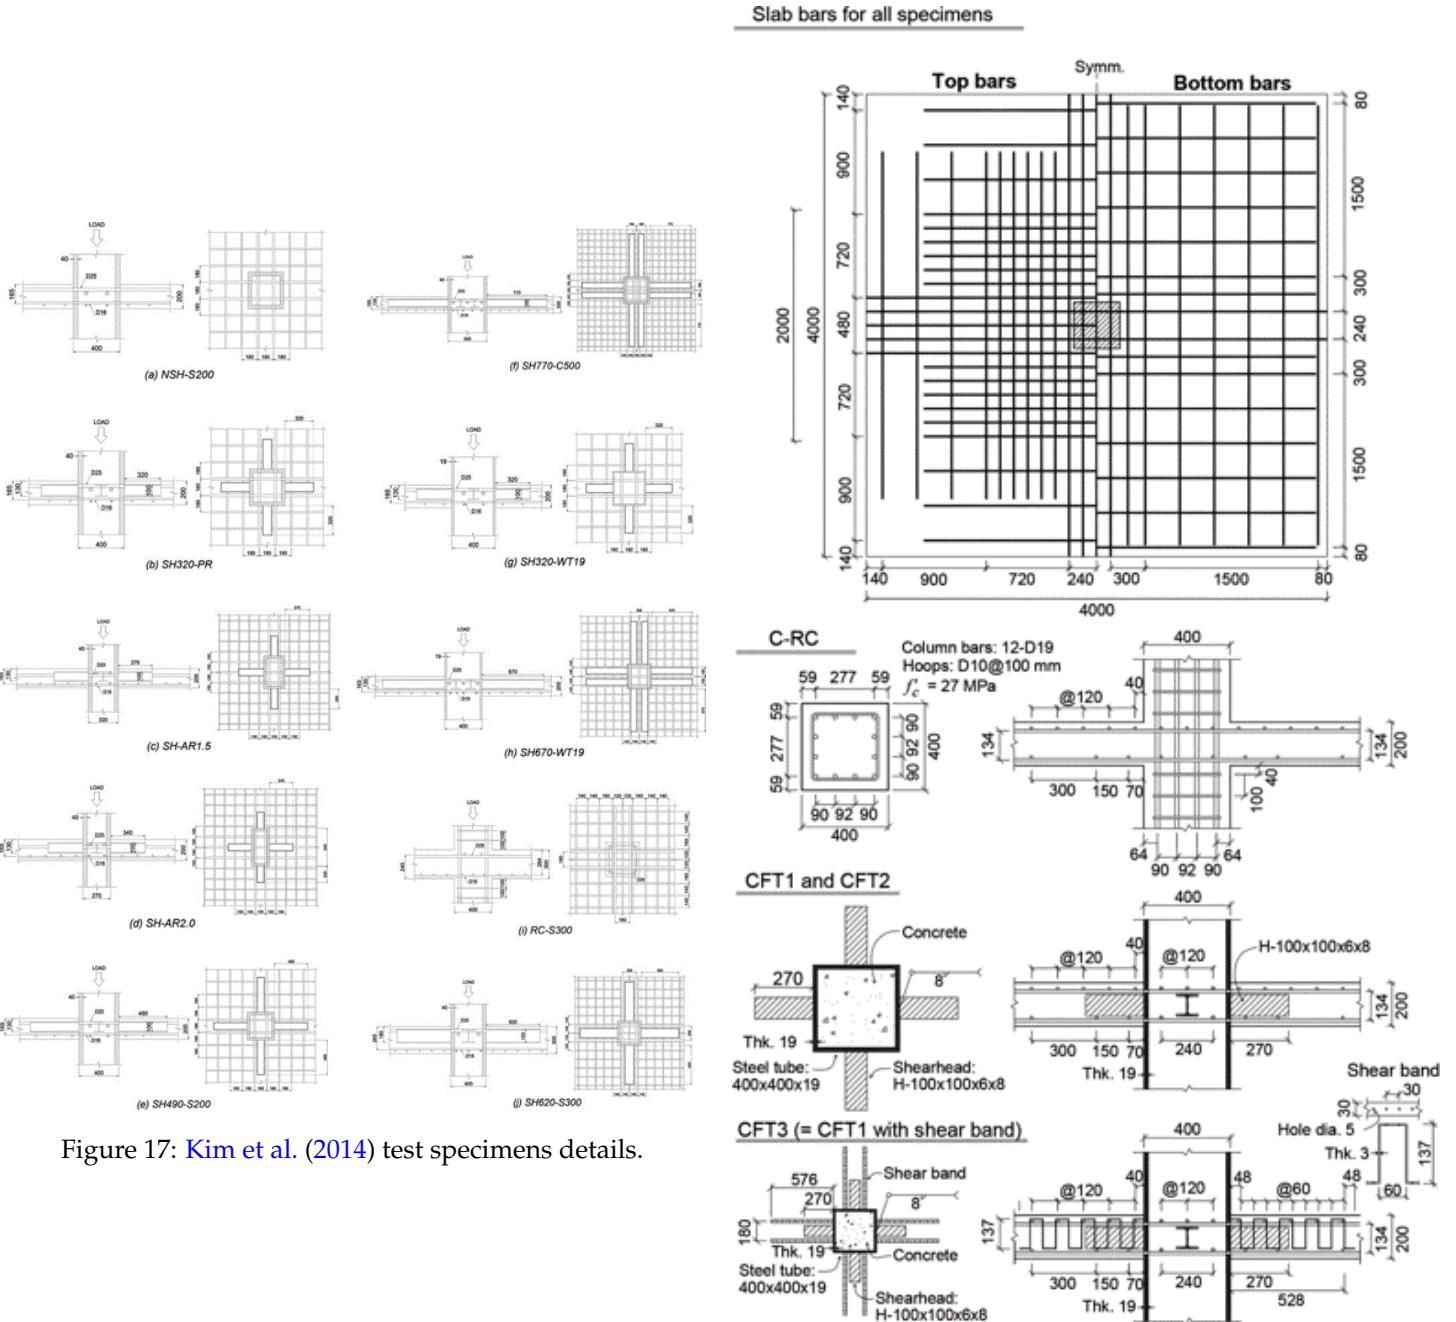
[Kim et al. \(2014\)](#) test specimens details.
